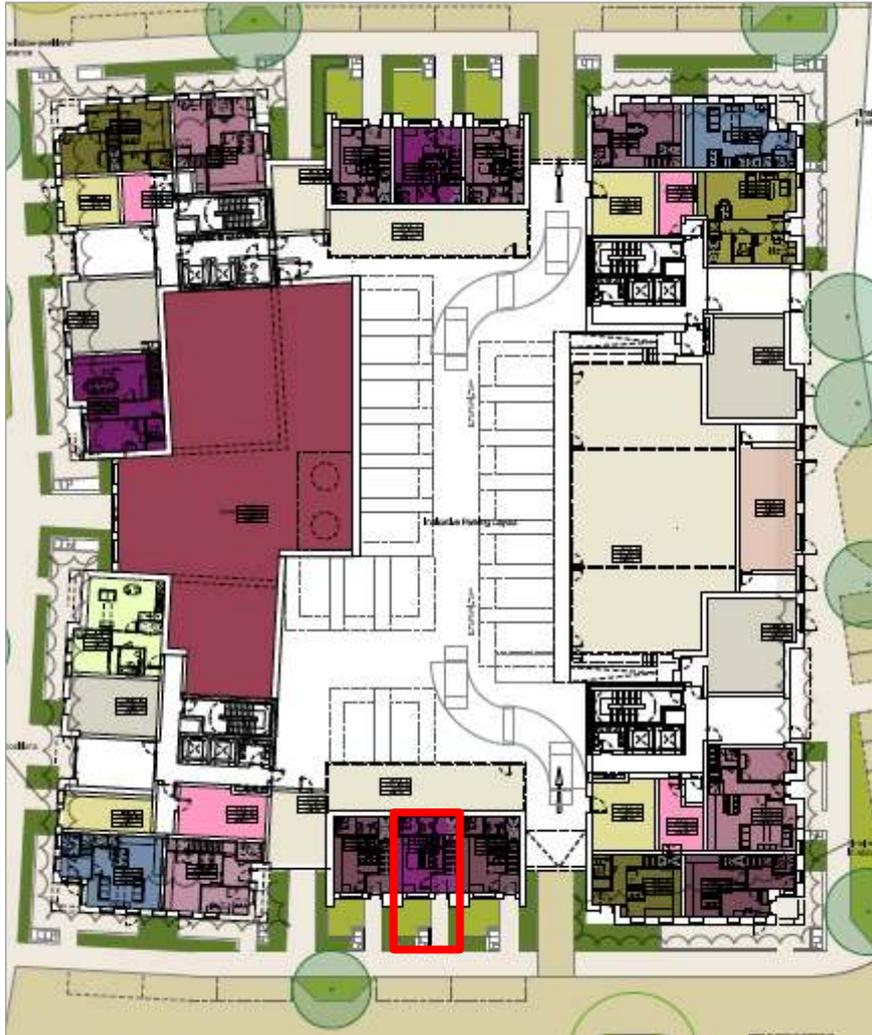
Block E, ground floor level selected Maisonette facing south (Patel Taylor drawings 21.09.2020).
